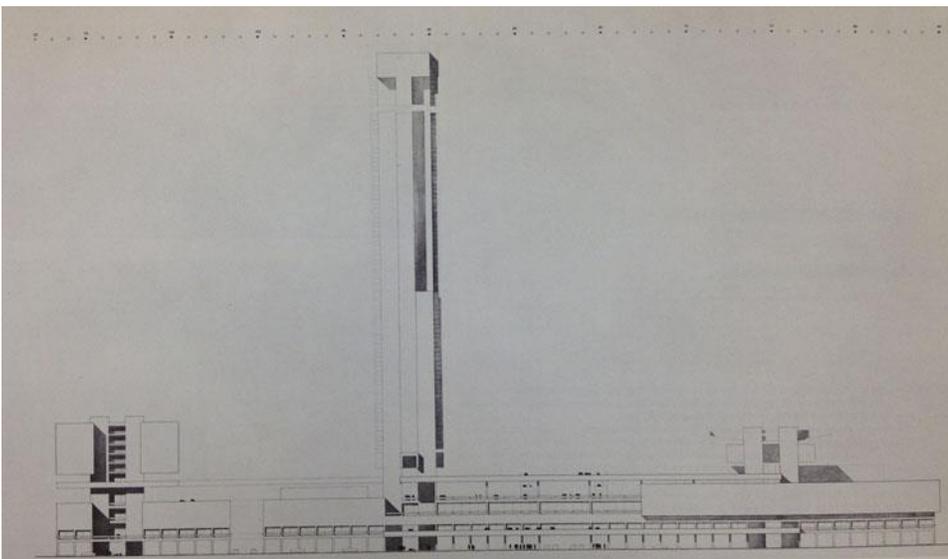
Concept section drawing Columbia Plan for Main Place, published 1961.
